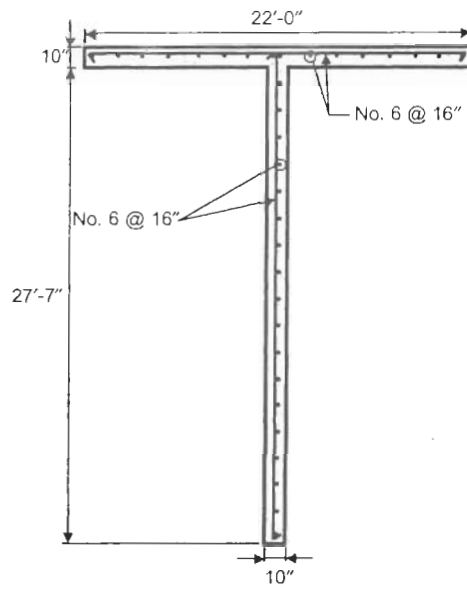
Reinforcement Details for Shear Wall Along Line 5 (SDC E)
